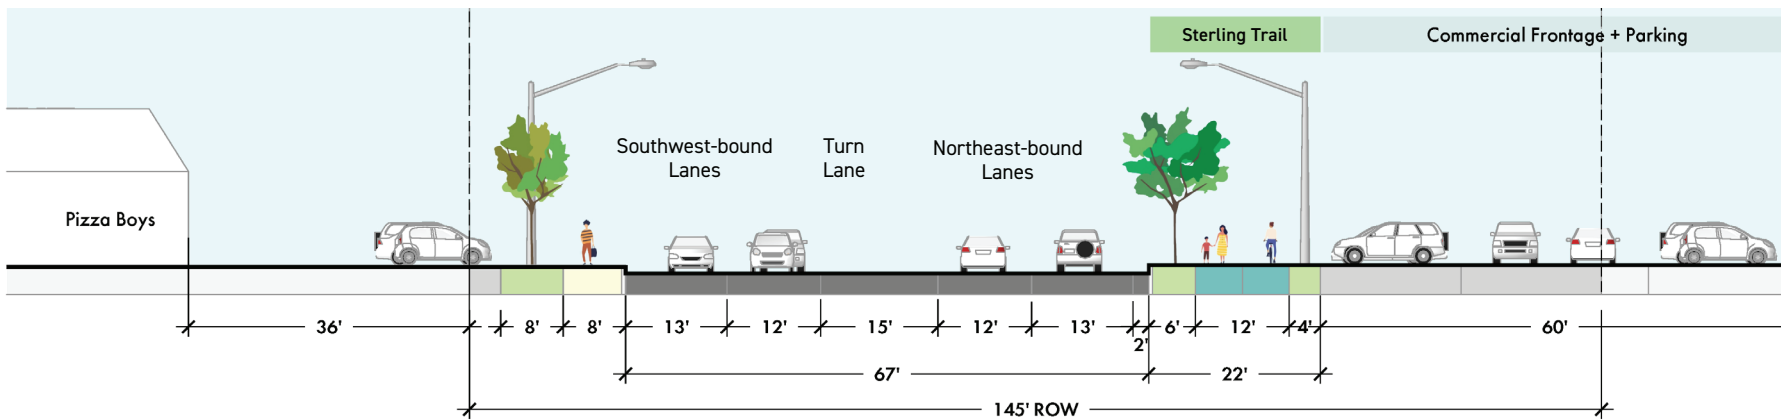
Proposed Section AA: Sterling Highway Multi-Use Trail
